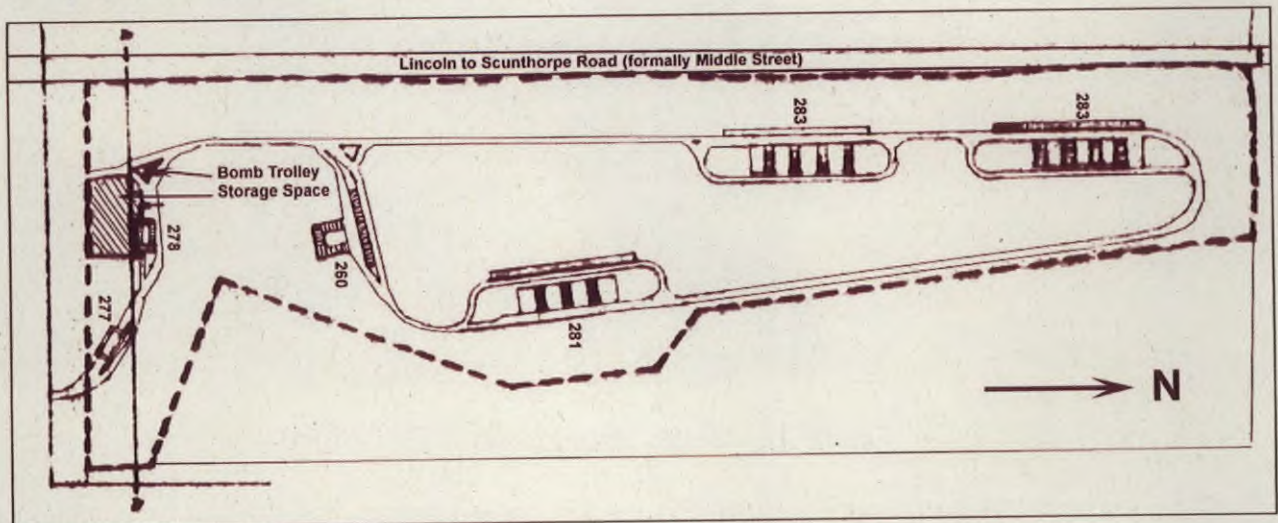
Extract from 1946 Air Ministry Plan, detailing the new bomb stores.
